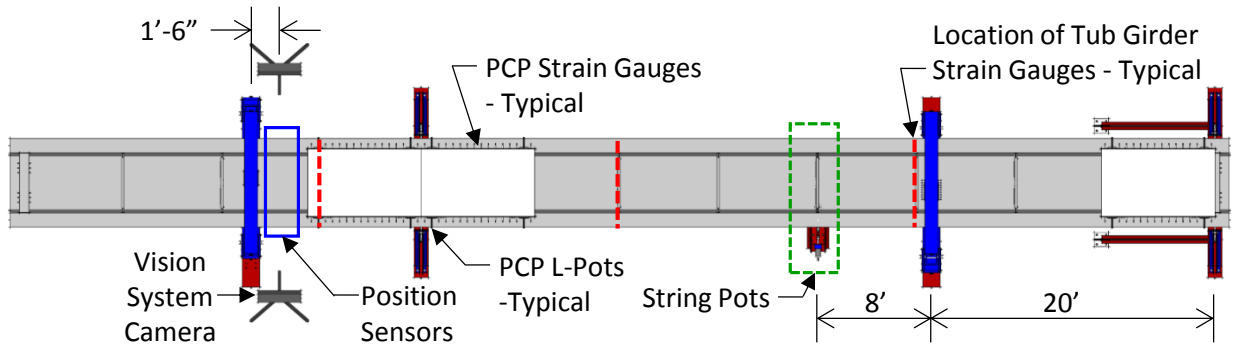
Instrumentation Layout for Overhang System – Plan View
